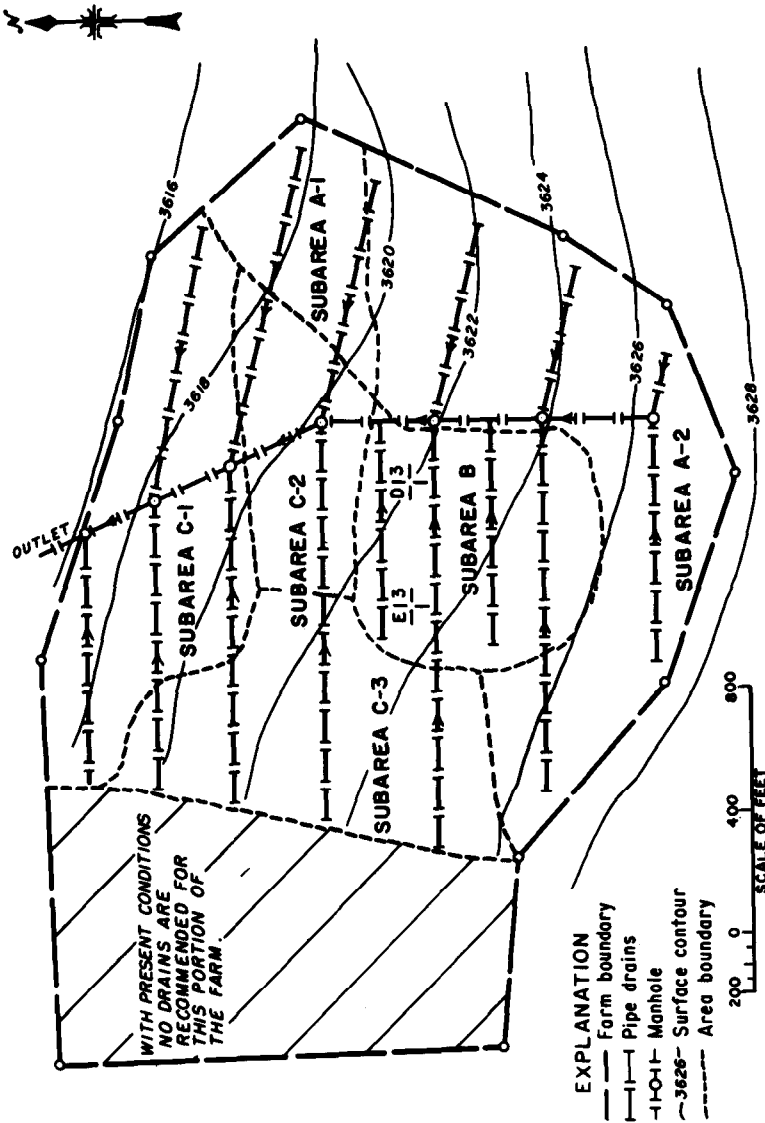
Location of pipe drains on the sample farm. Drawing 103-D-679.
